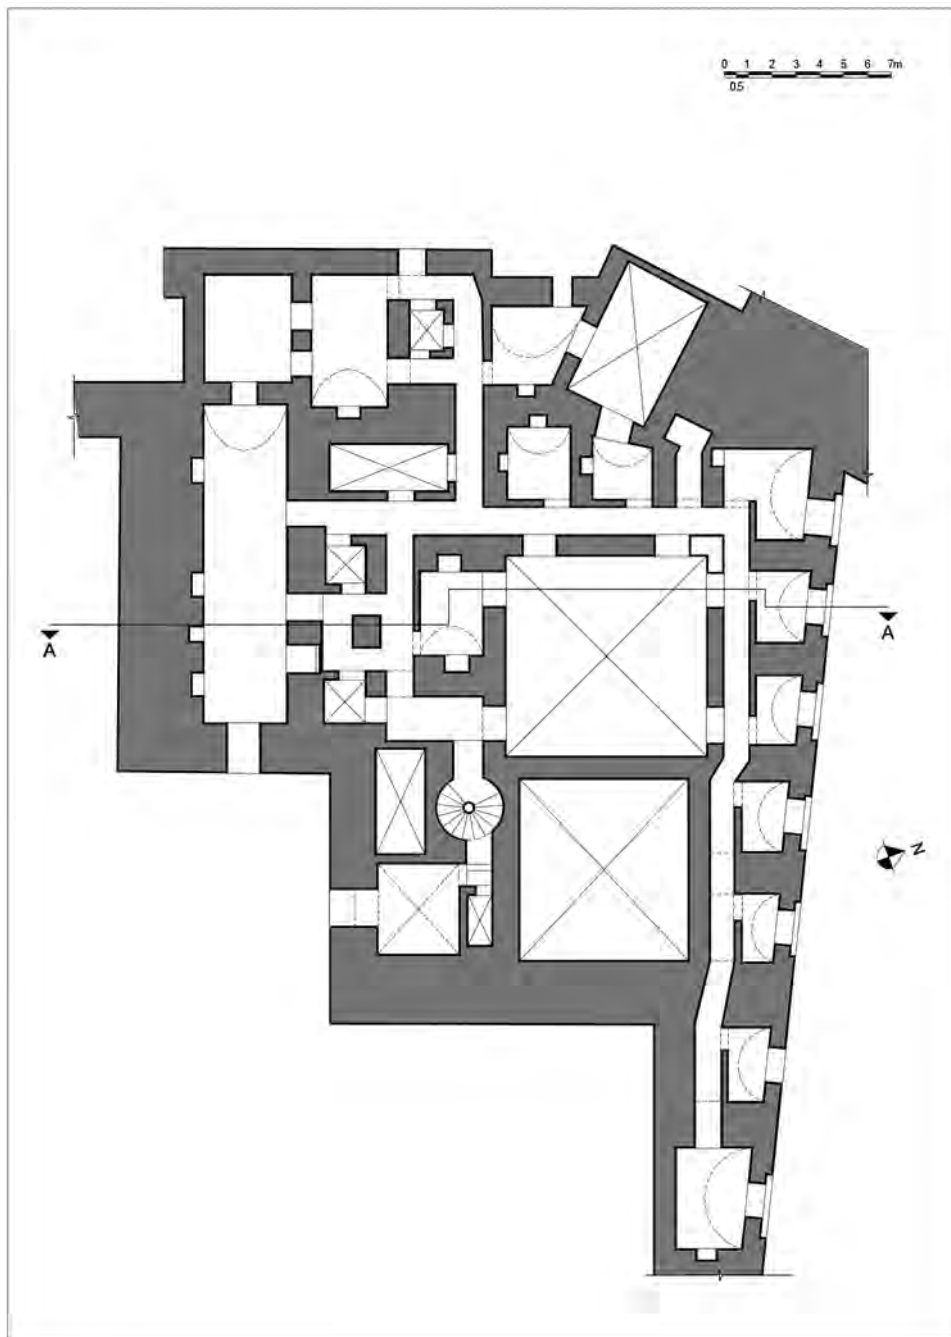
Mālikīyah Madrasah, Complex of Sultan Ḥasan, Cairo, fourth floor plan (H. Al-Harithy)
